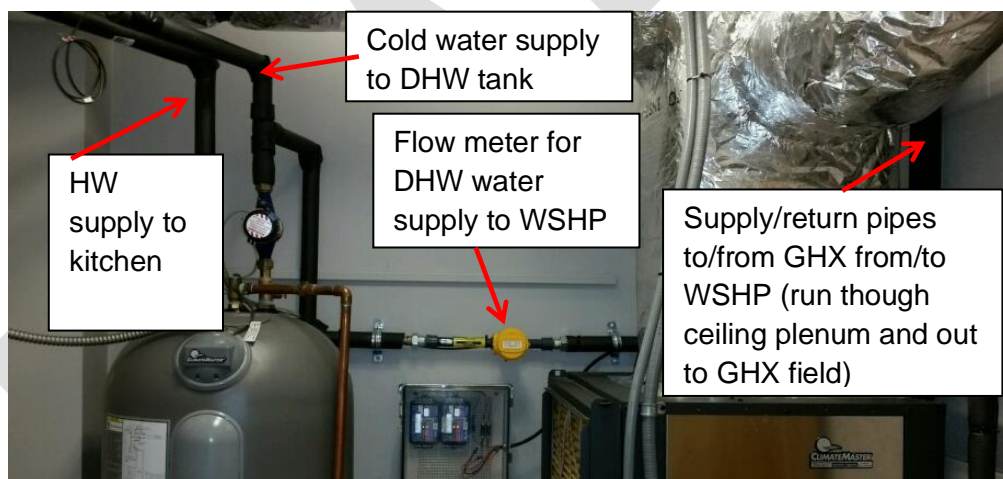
WH piping connections and flowmeters at the Knoxville site.
